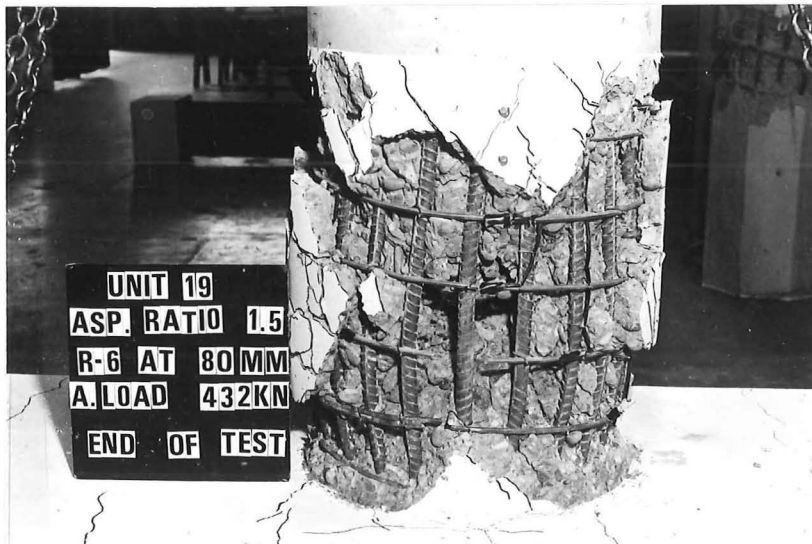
Final appearance of UNIT 19 after test (brittle shear failure)
